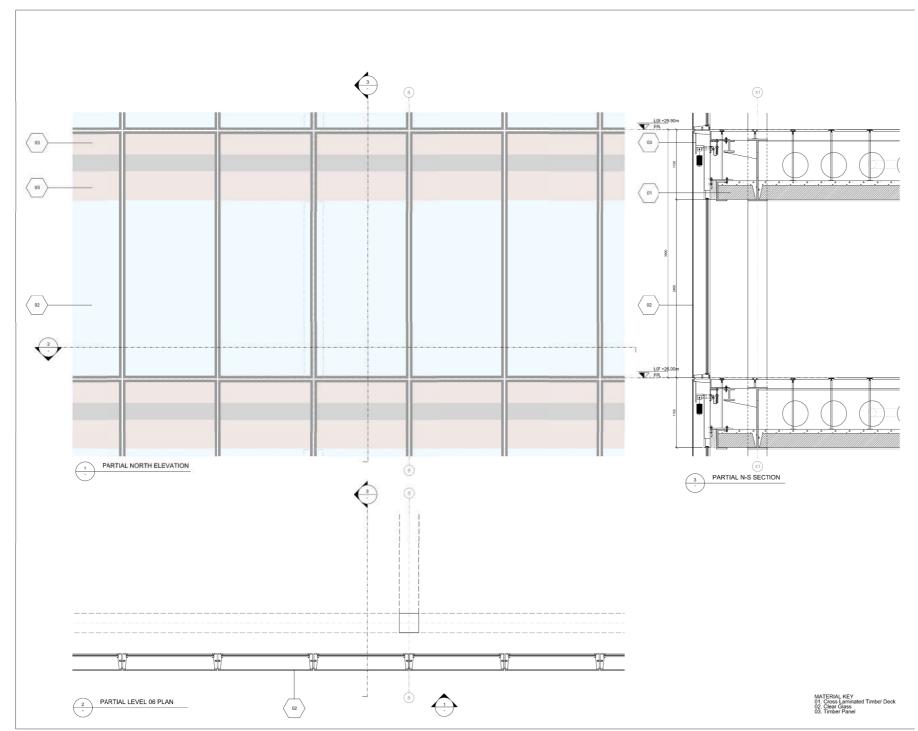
SH9 Facade Detail Fig 7.93 SH9 South-east view
